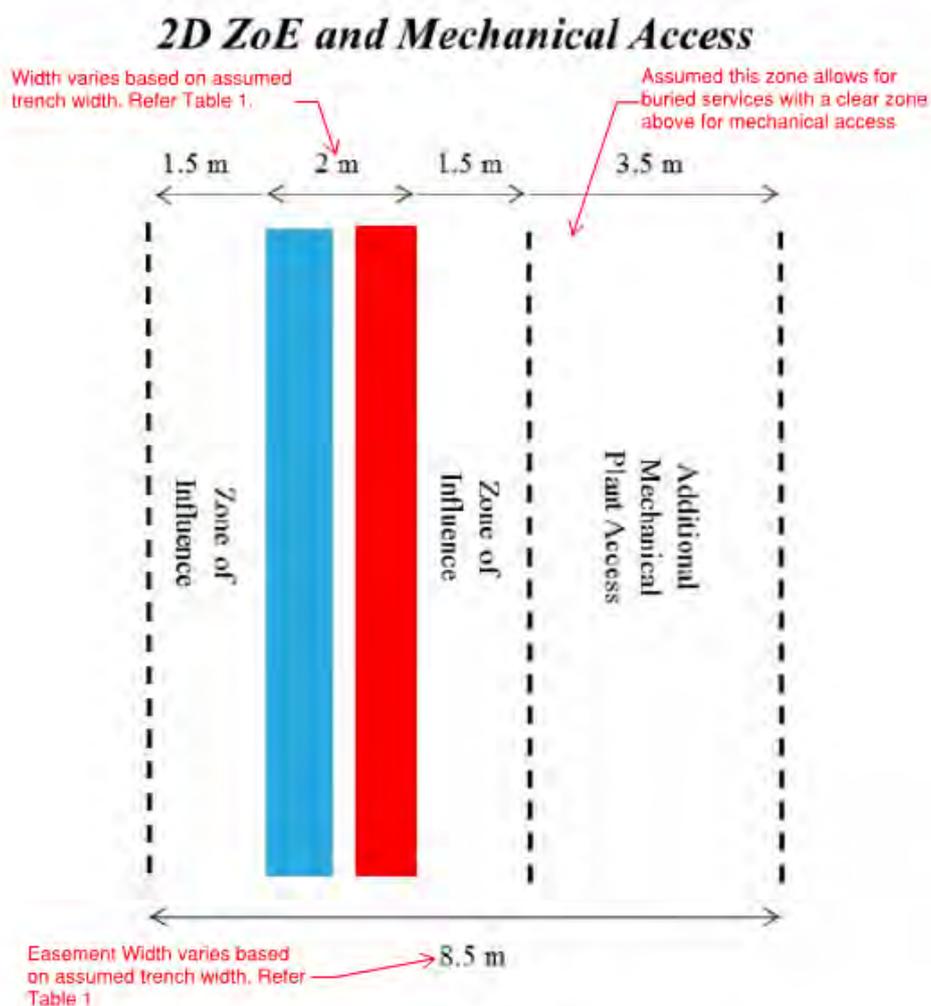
Discussed wayleaves between LVHN and NLWA, August 2014
